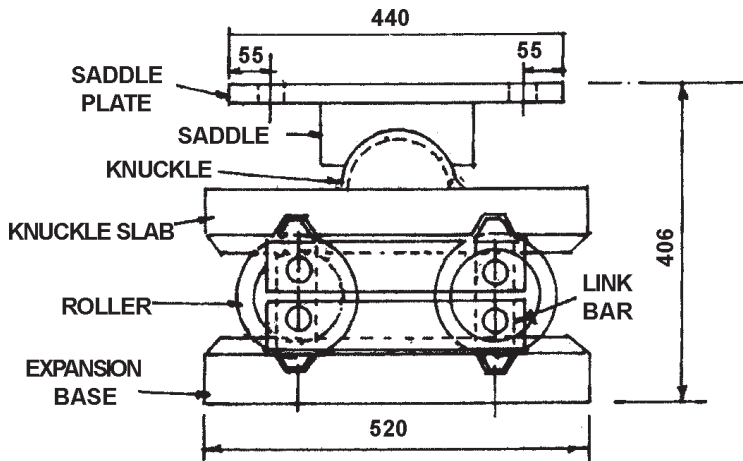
(a) Roller and rocker bearing - Expansion Bearing - Roller end
